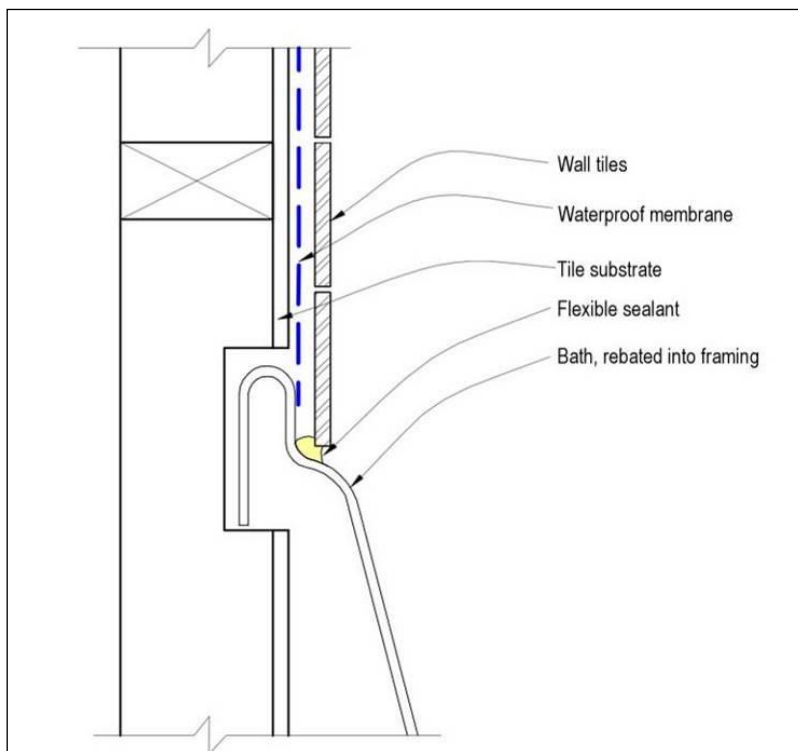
A bath lip checked into a wall stud and lining stops above the bath
